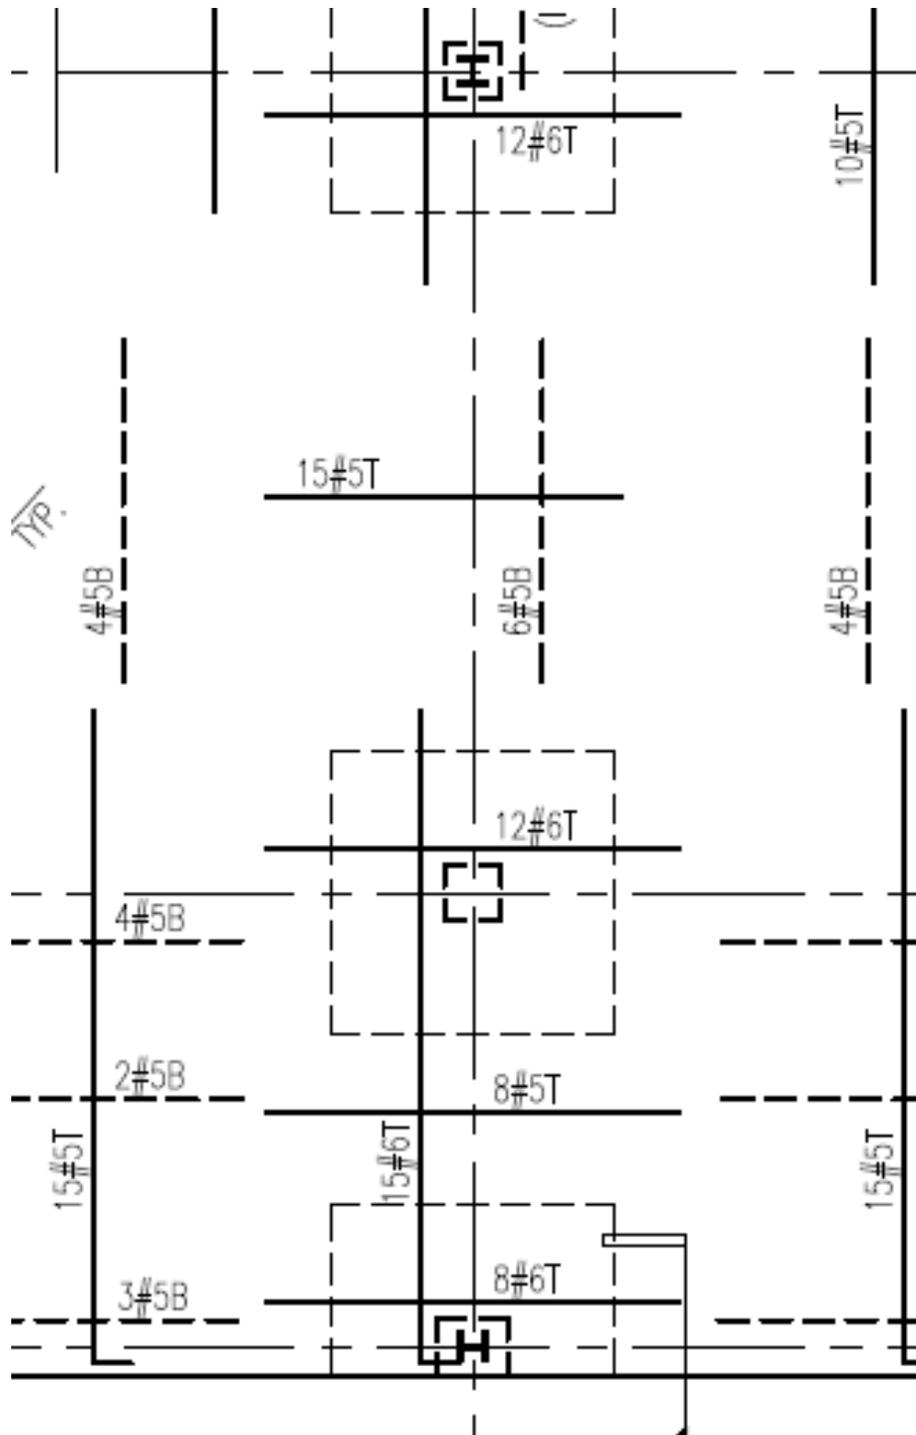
Existing Rebar Layout Used To Check Design of Office Levels (Source: Cagley & Assoc. Drawing S-205)
